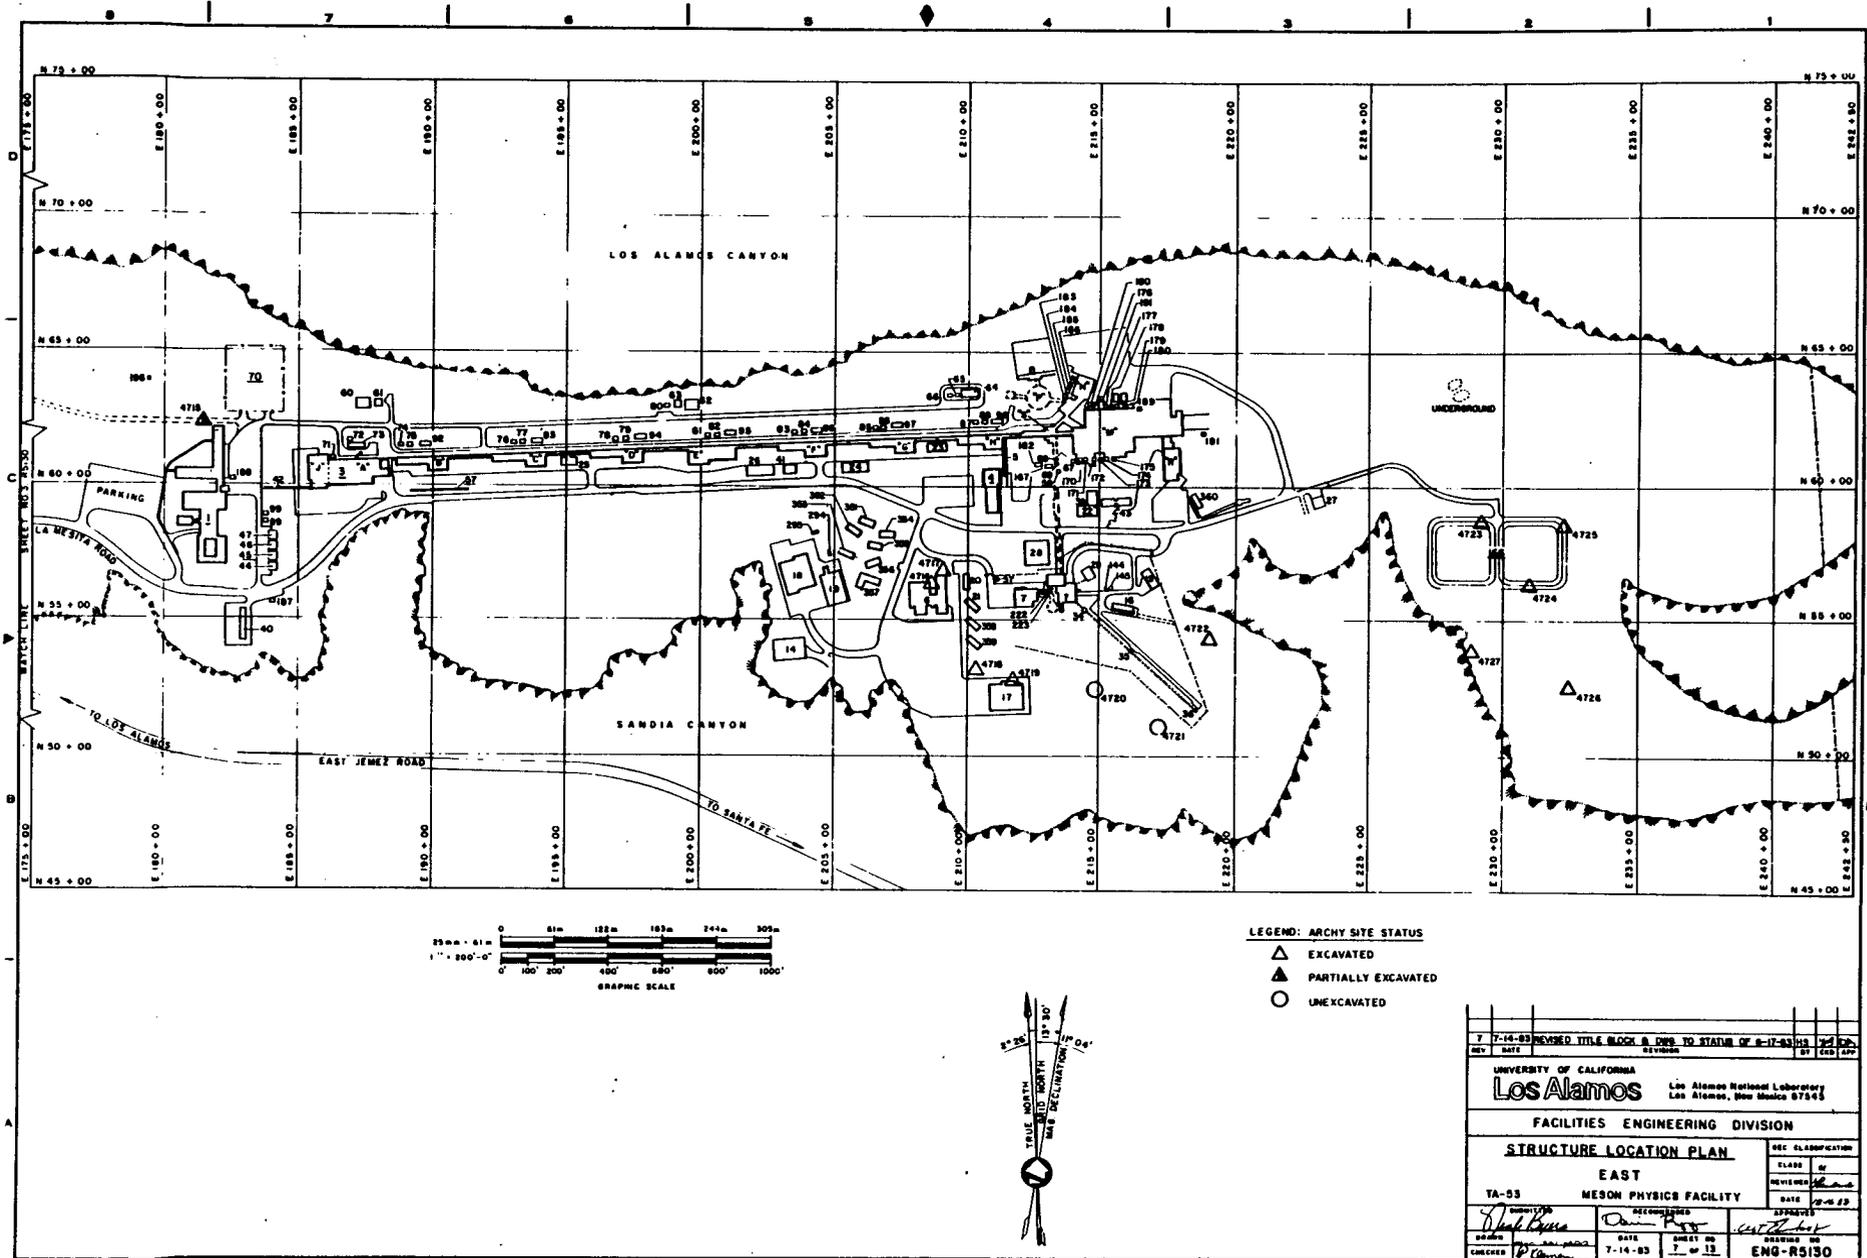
Structure Location Plan for TA-53 - Meson Physics Facility (1983 Drawing from the LANL Technical Area Structure Location Plans)
